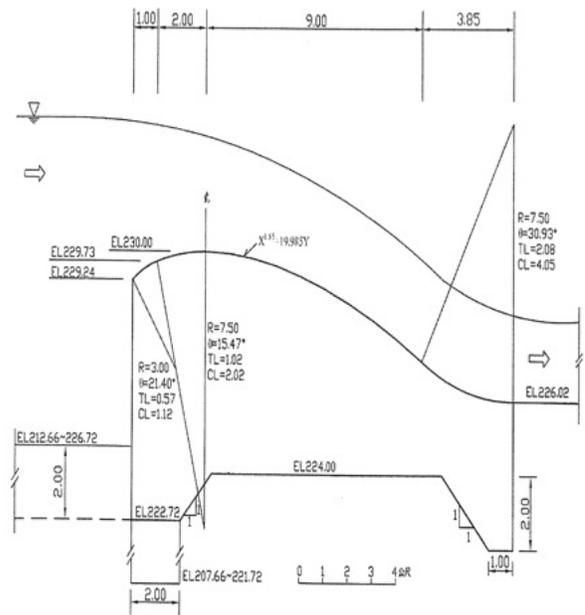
Shihmen Diversion Discharge A1-1 Spillway Standard Design Section
